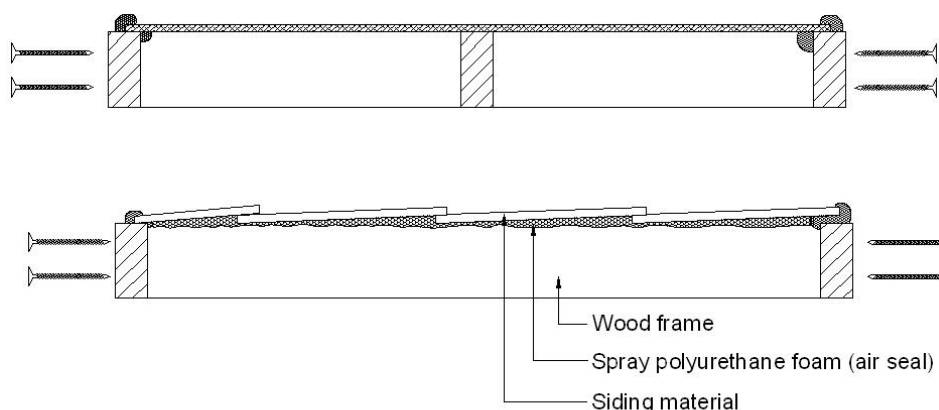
Cross section detail of the siding board/wood frame interface with sprayed in place polyurethane to impart air tightness around the perimeter of the assembly.
